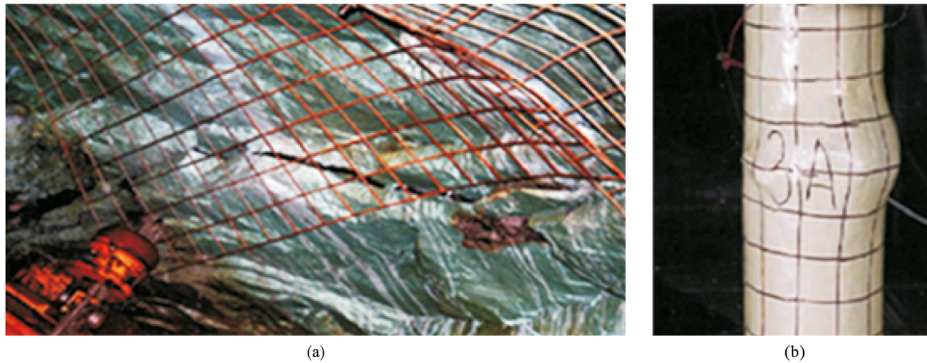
(a) Example of a TSL in tensile/tearing failure mode due to excessive deformation of the underlying rock without adhesion failure; (b) example of compressive rock failure accompanied by adhesion failure, resulting in full retention of the failing rock.
